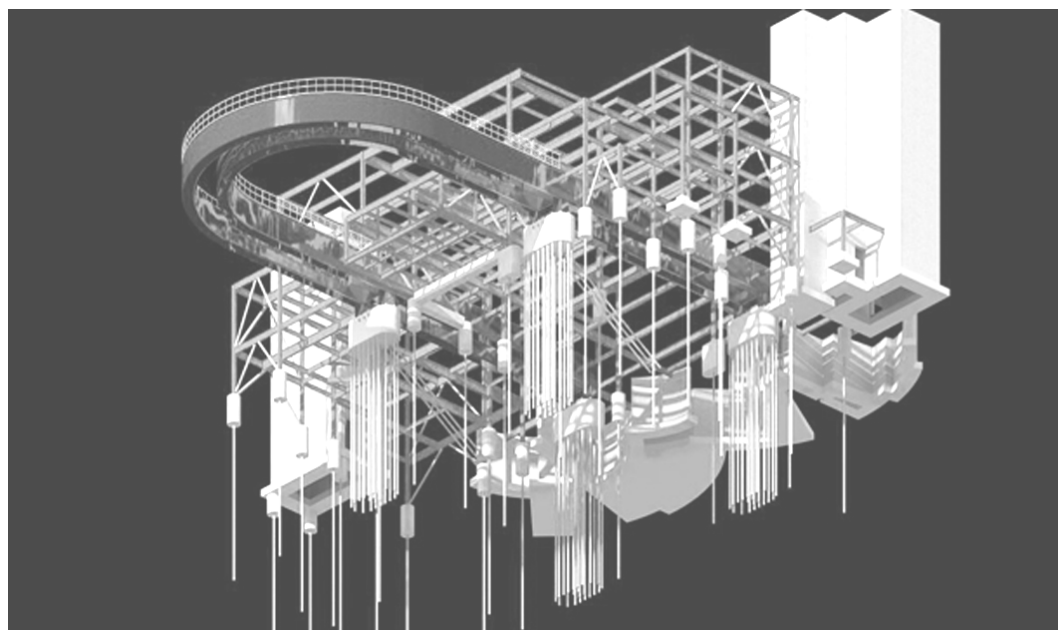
Anchoring mode for the Skywalk footbridge. Source: [20]
